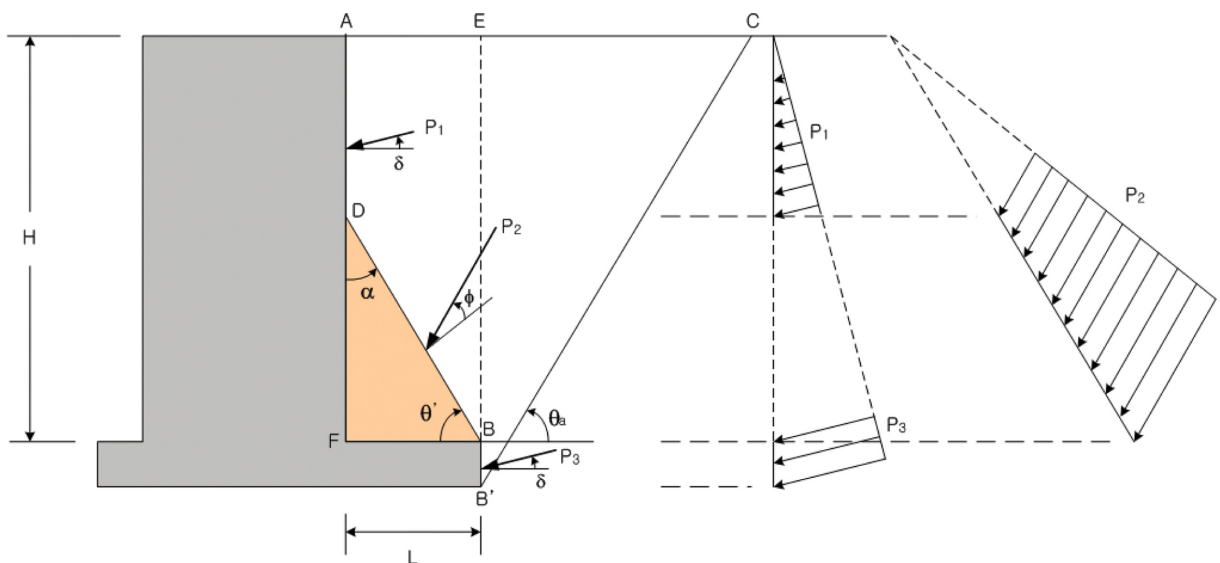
Earth pressure distribution and failure planes behind caisson wall with the short heel.
